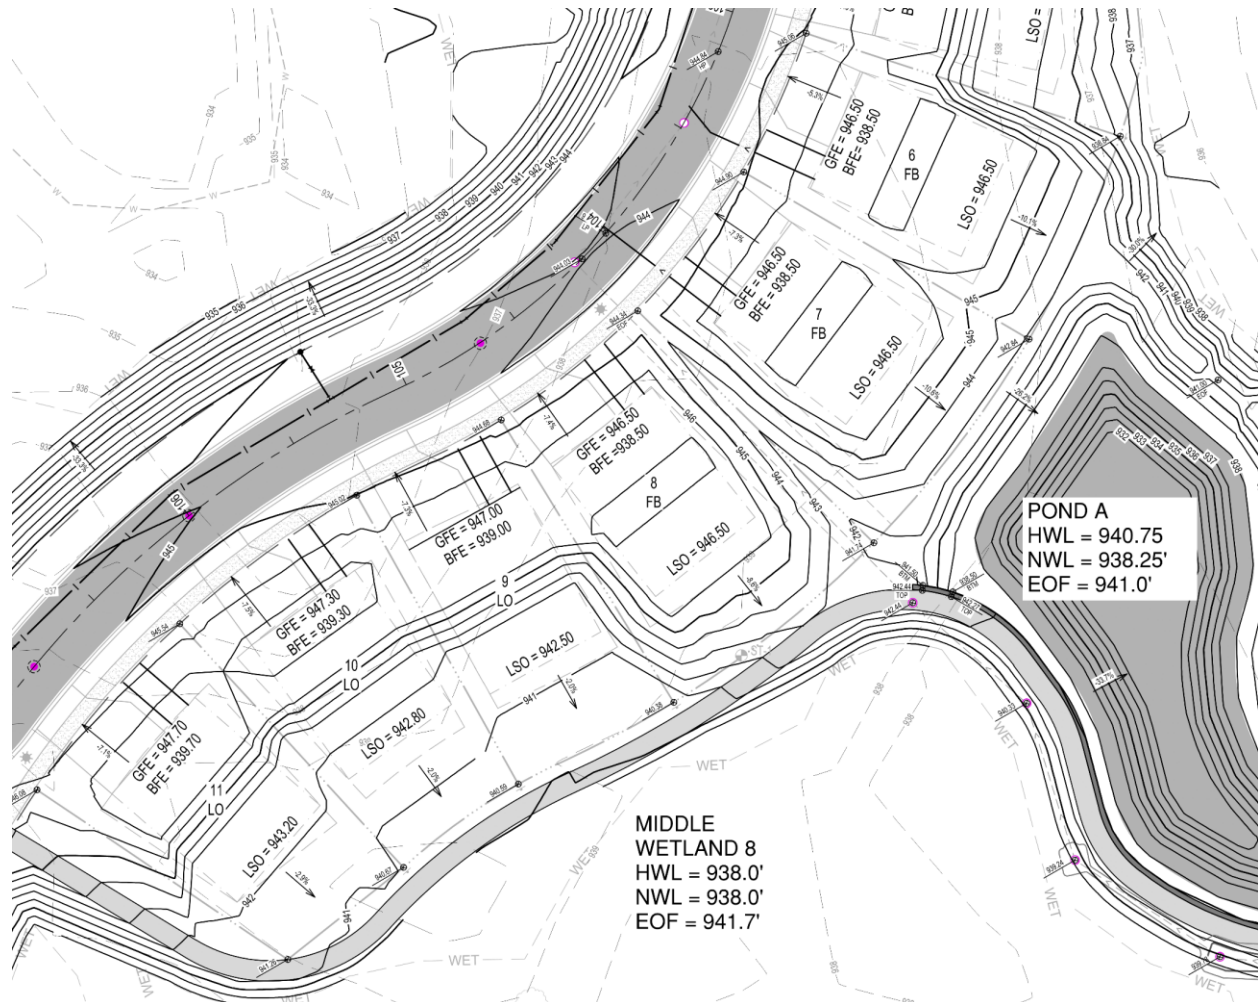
Structure Elevations for Lots 6 through 11 (LSO = Low Opening, BFE = Low Floor)
